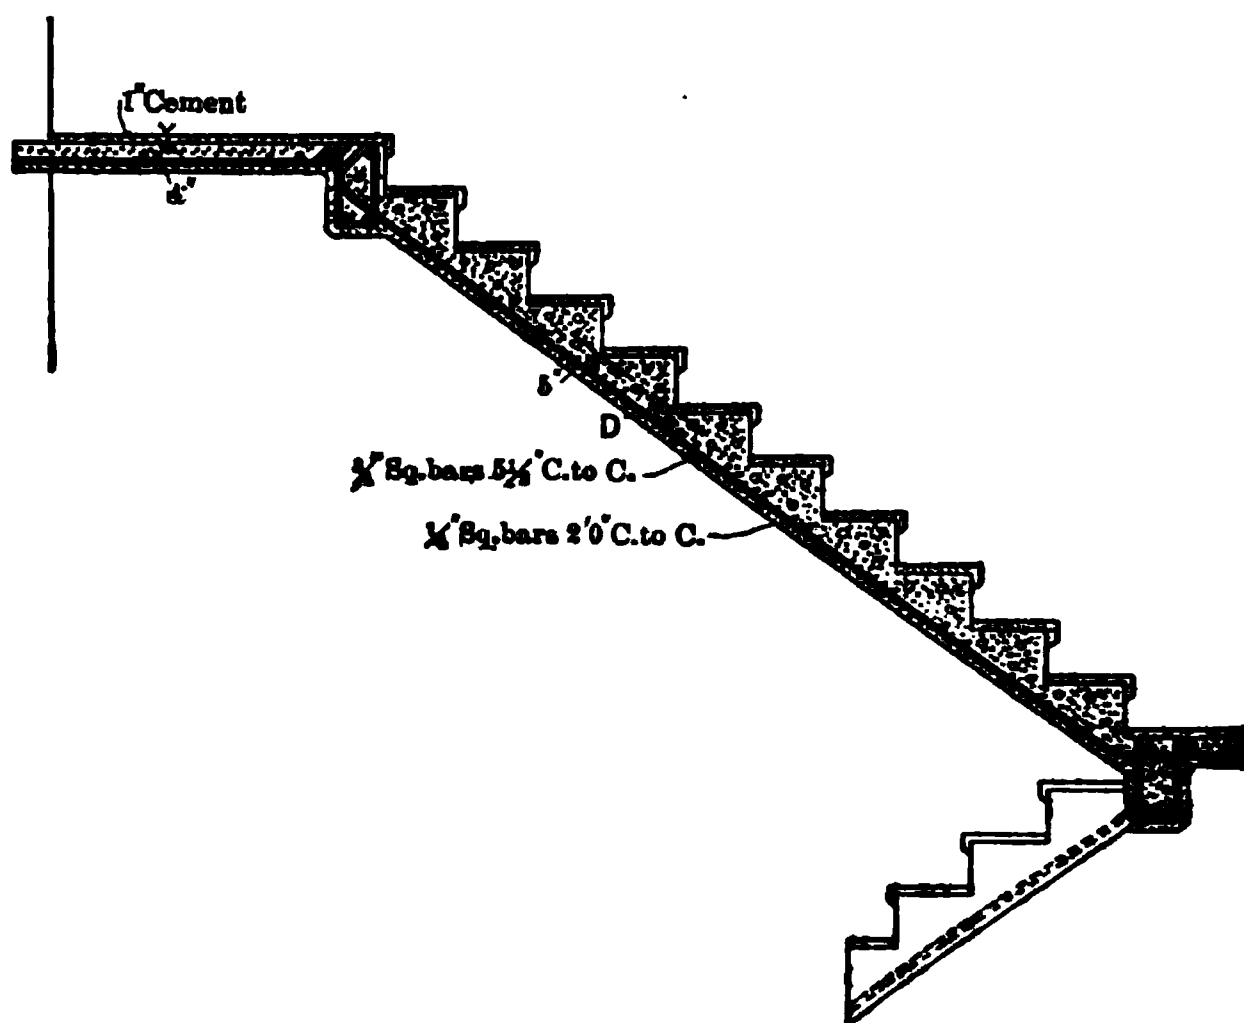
Section through Flight of Reinforced-concrete Stairs
